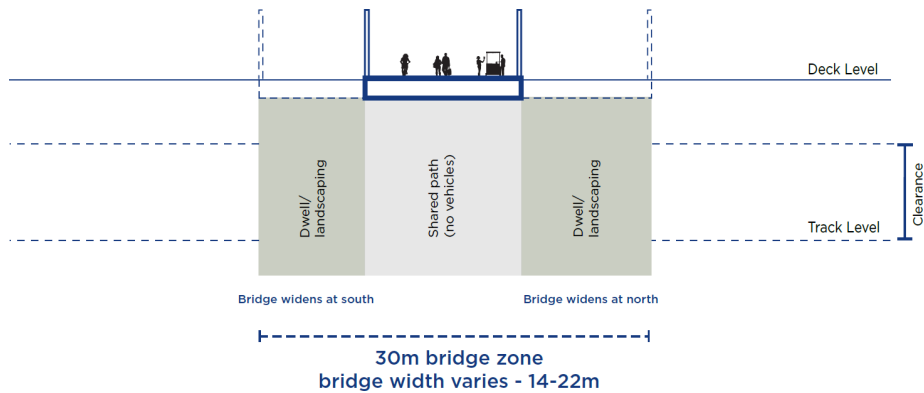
Typical cross-section 8, Devonshire Street Bridge
